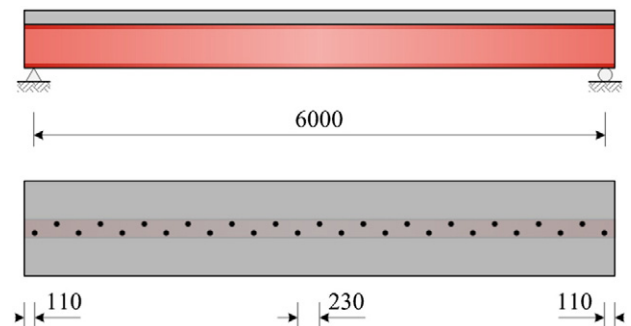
Longitudinal geometry and shear connector arrangement (unit: mm).
